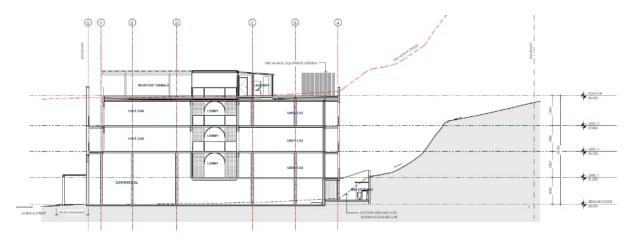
RMA/2022/801 – Side elevation (east) - a consented 4 storey development with lightweight roof terrace. Equivalent in height to the former Harbourlight Theatre, located on the subject site at 24 London Street. (See Appendix3 for more detail), with artists impression of the proposed building within the adjacent built context.
